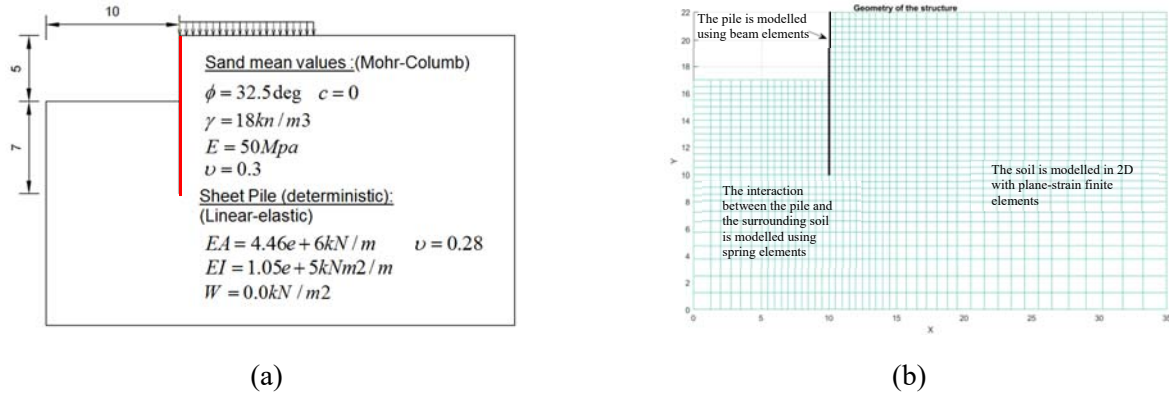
(a) Sheet pile wall (without anchors). (b) Finite element discretization of the soil.
